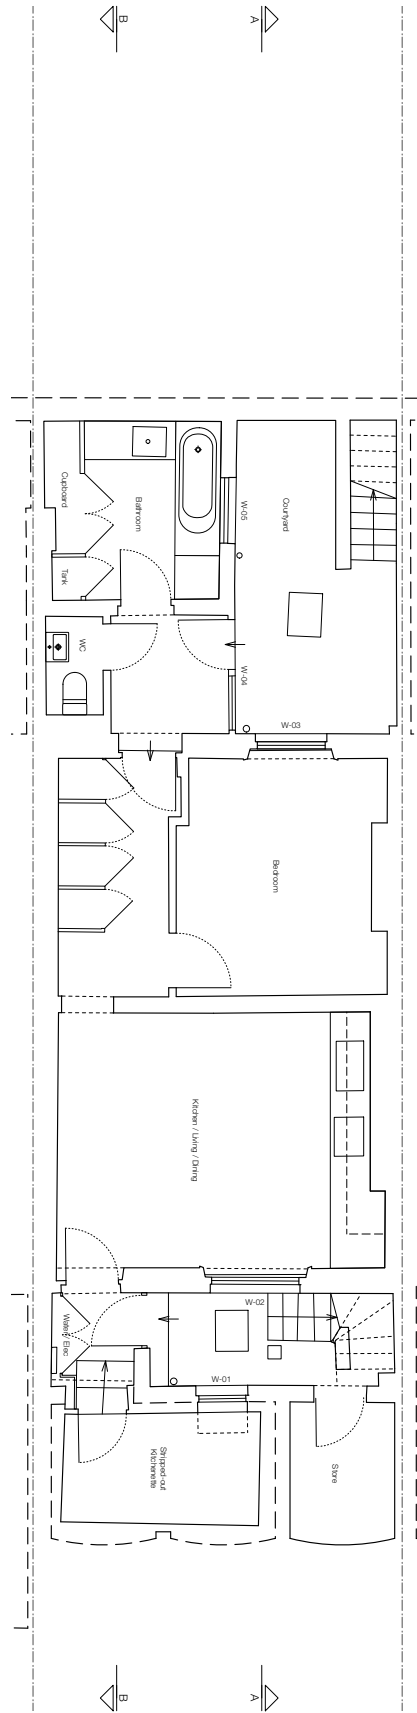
Drawings from the 1980's to show the extent of alterations undertaken to the lower ground floor
